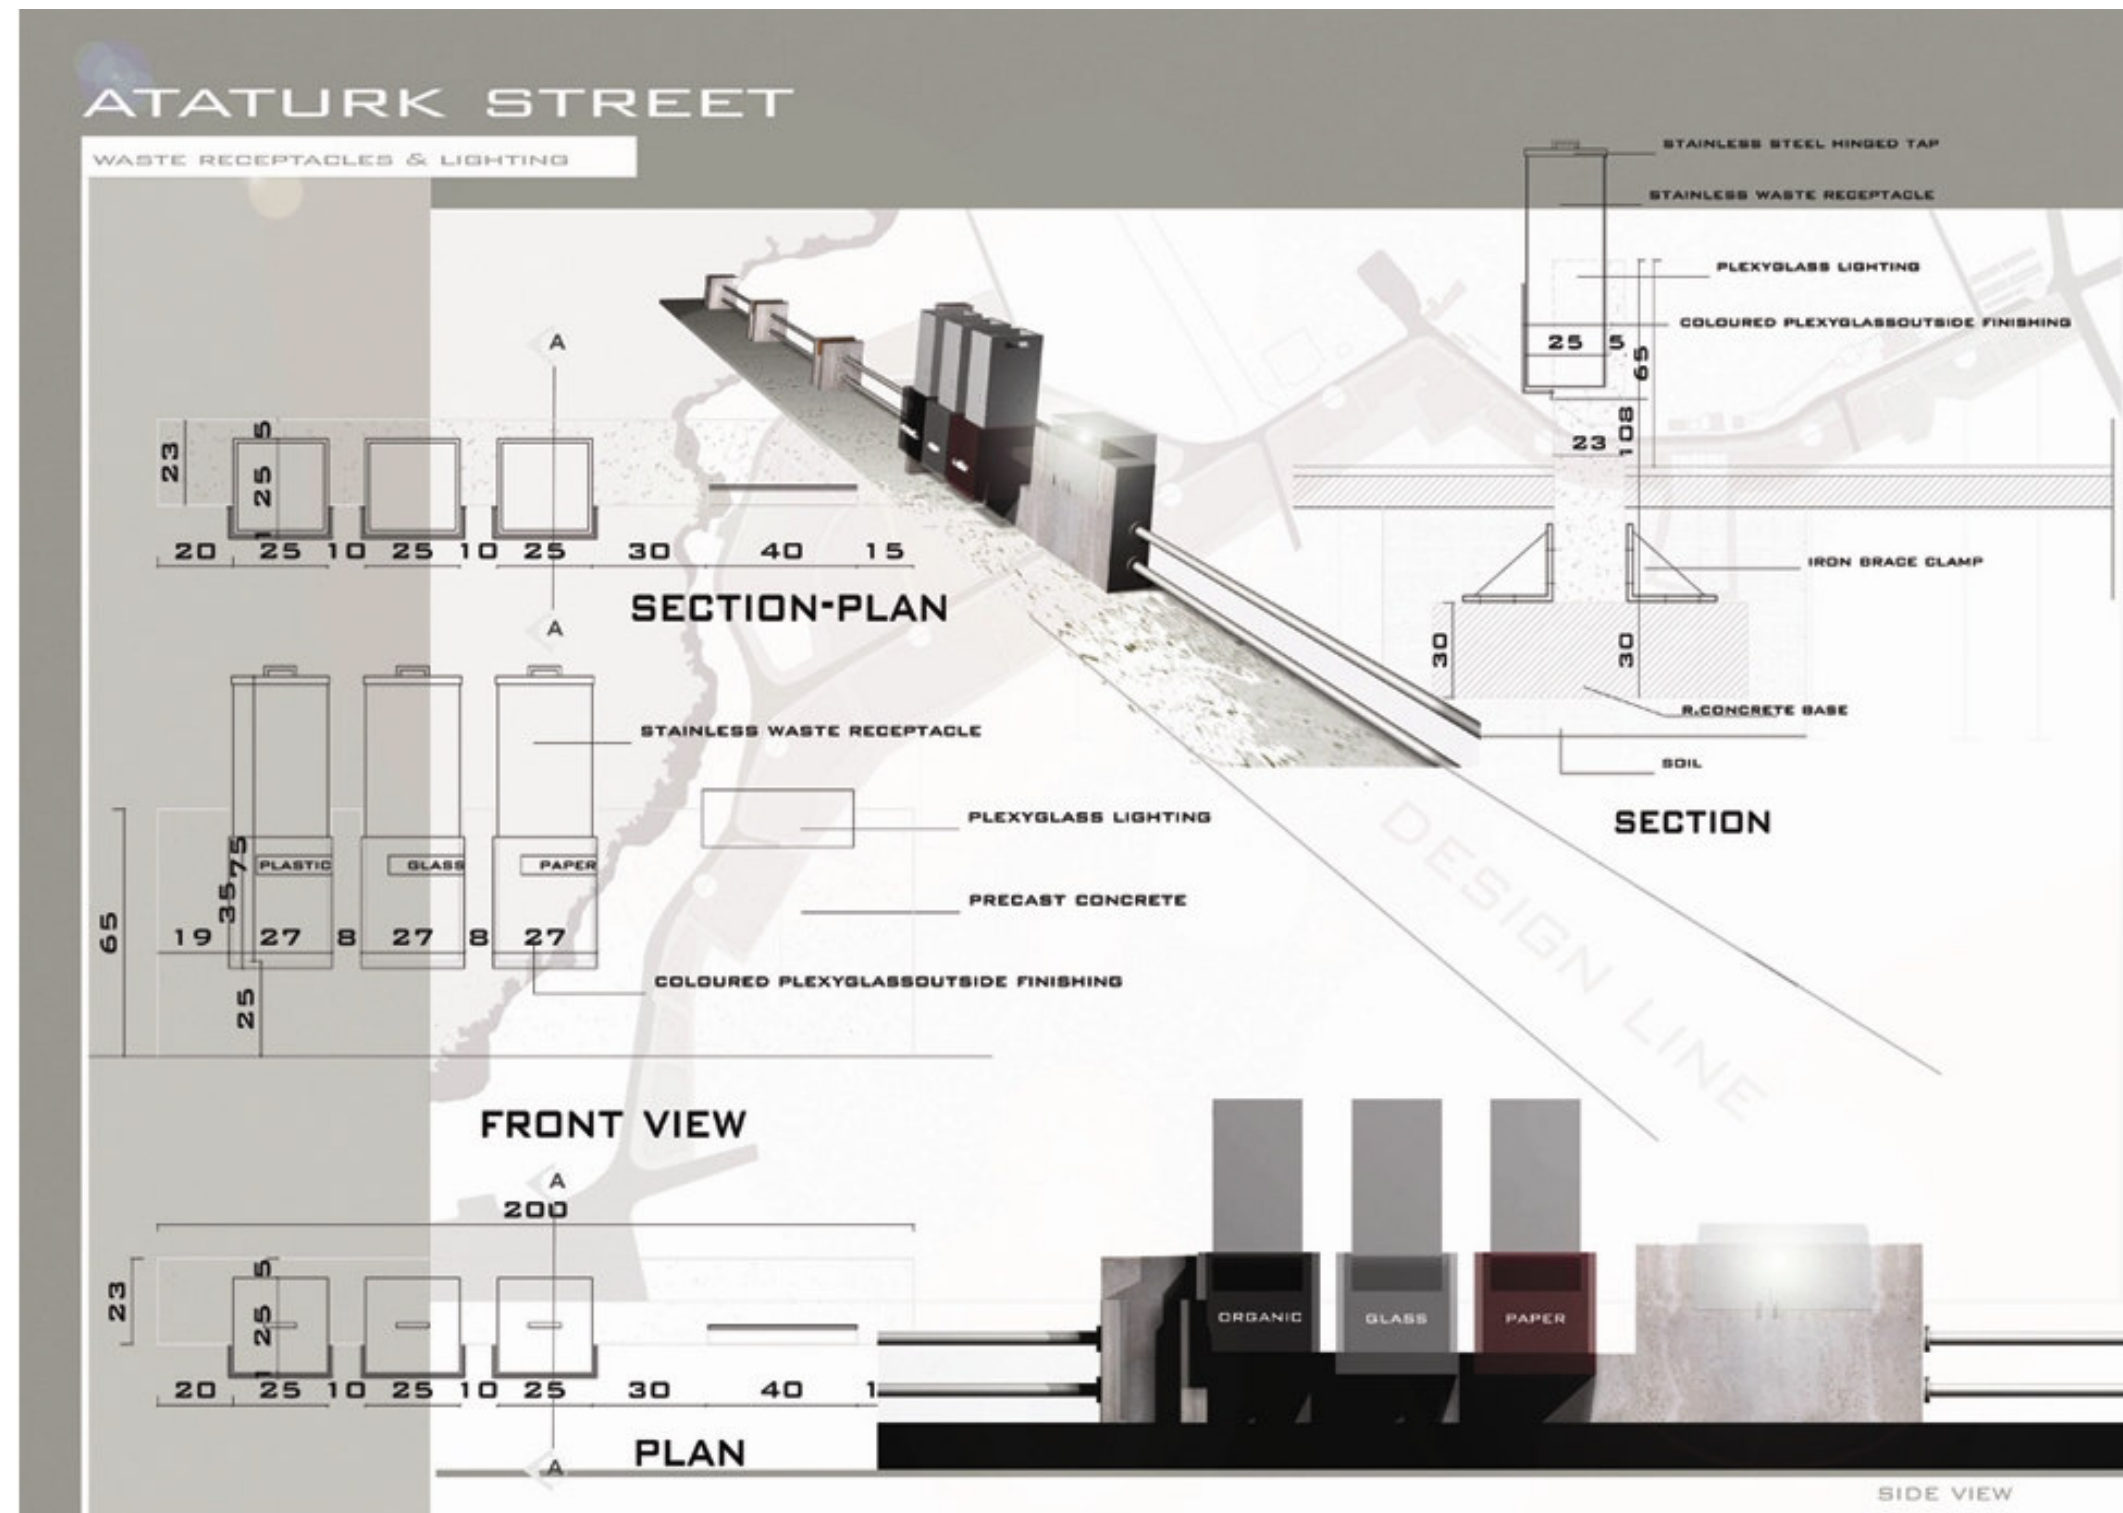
Drawing of Wastereceptacle & Lighting.
